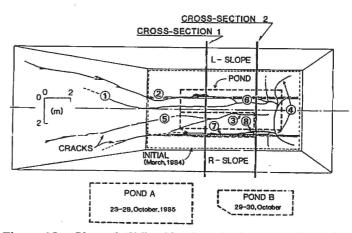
Plan of Chiba No. 2 embankment and cracks developed by water supply from the pond.
